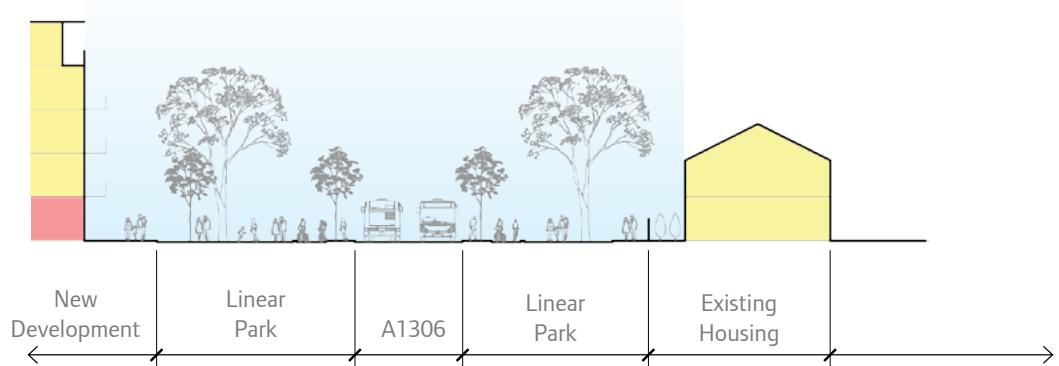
Sketch section illustrating the potential reduction of carriageway to create a new linear park
